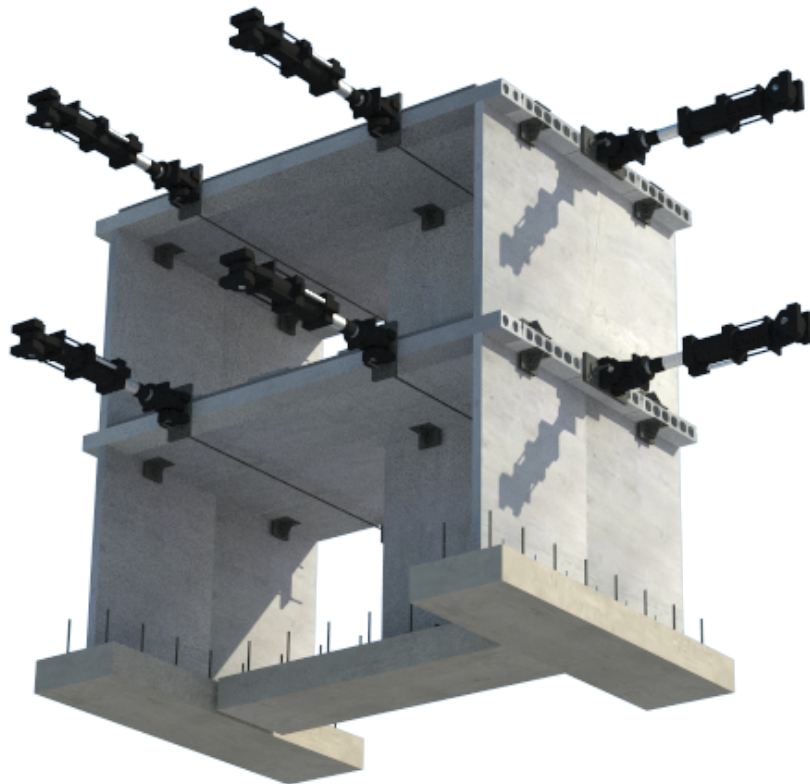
Isometric views of the installed instrumentation – Bottom side, back view.
